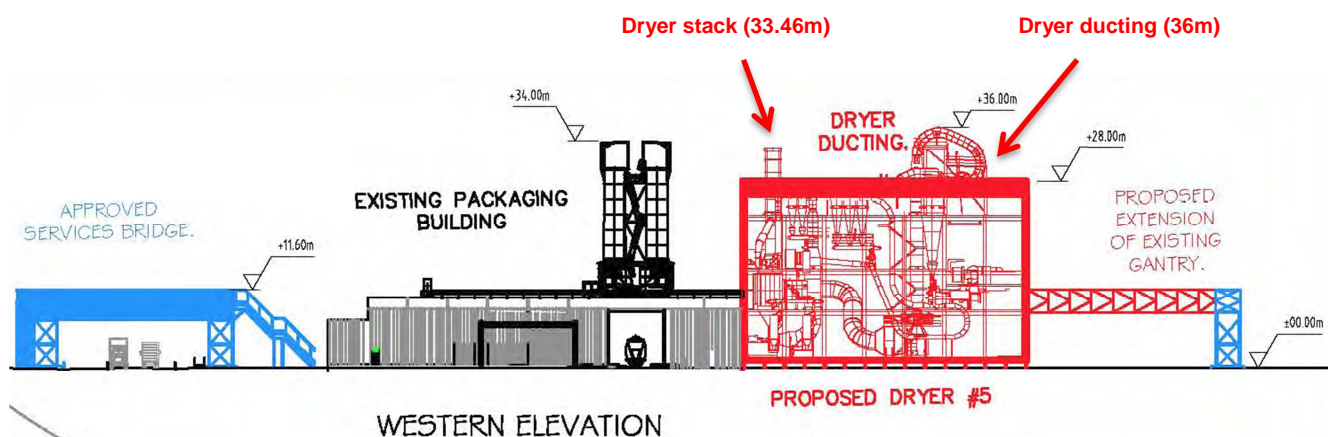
Elevation of starch dryer compared to existing factory buildings
